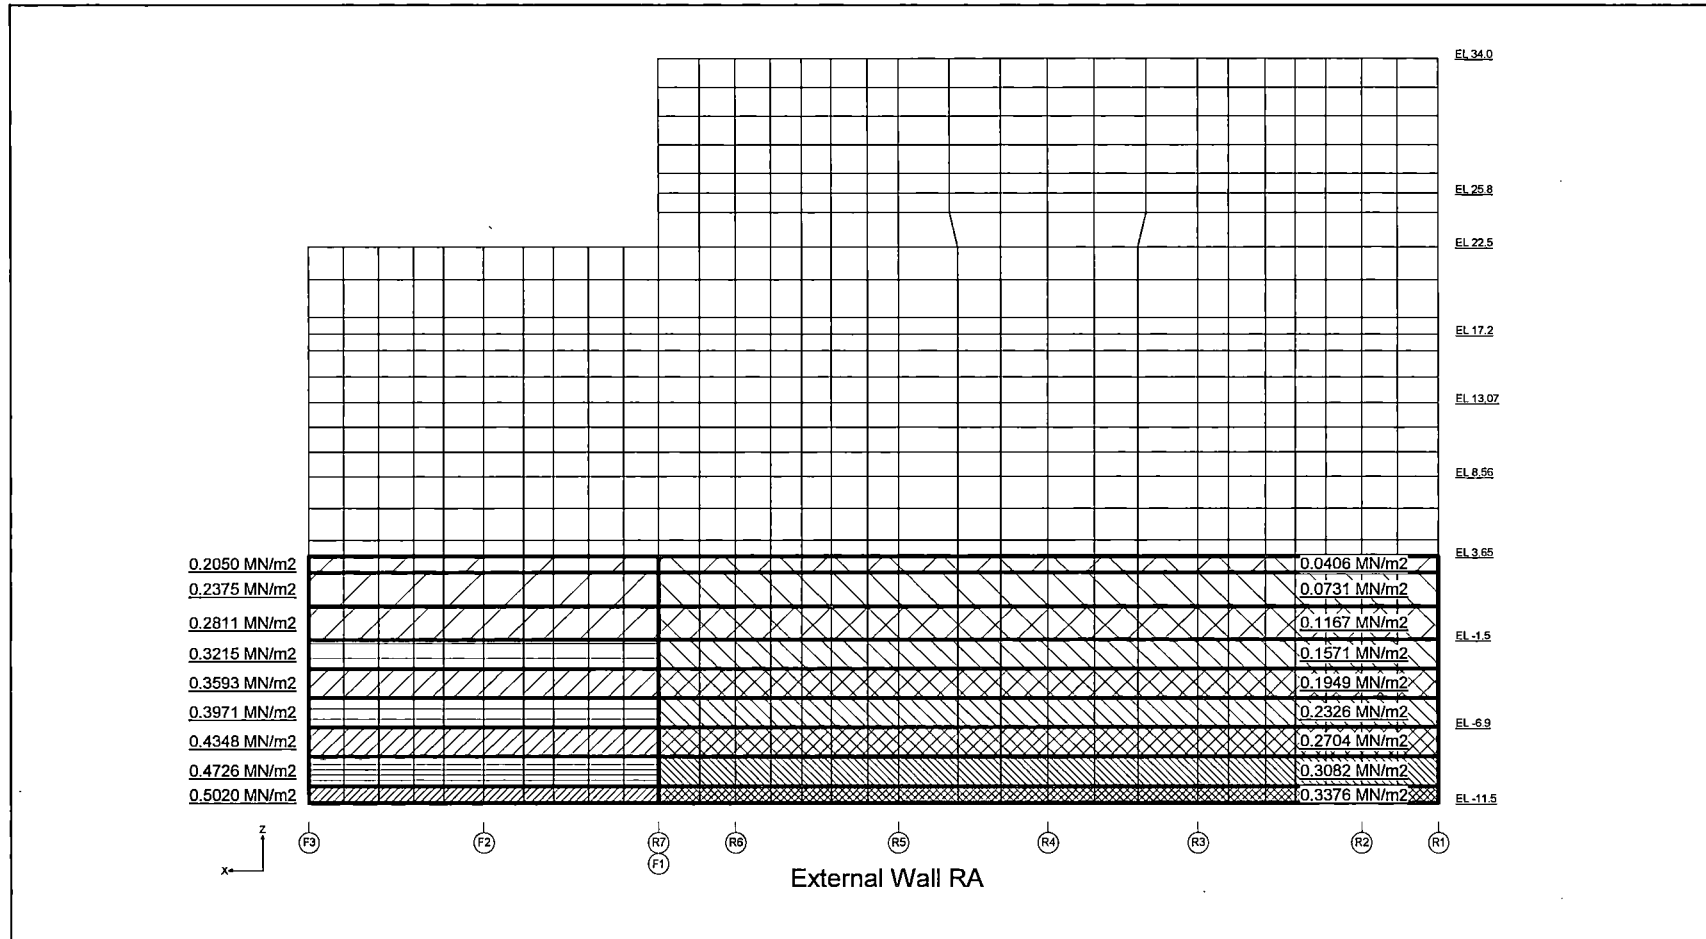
Lateral Soil Pressure Load at Rest (RA/FA External Wall)
